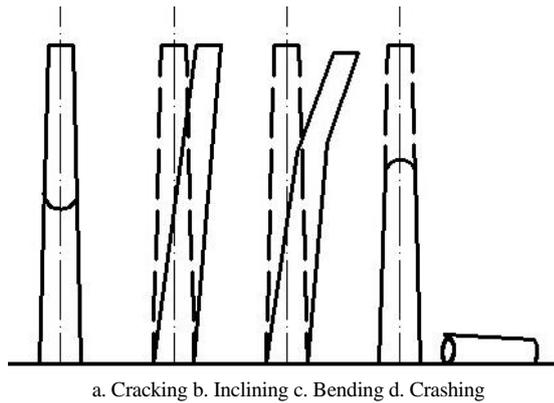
Seismic damage diagram of reinforced concrete chimney
